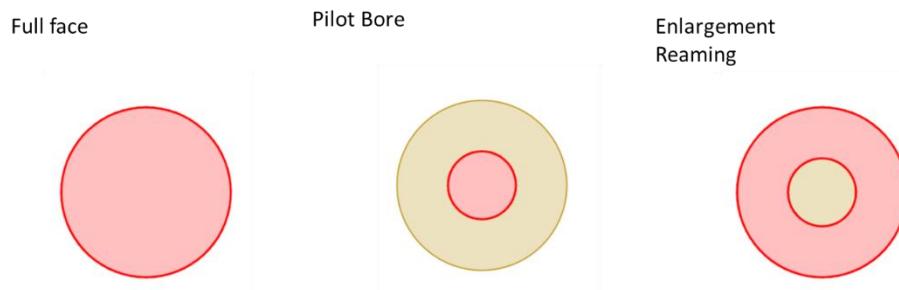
Typical excavation stages of mechanical tunnelling (source SBB/ILF)
